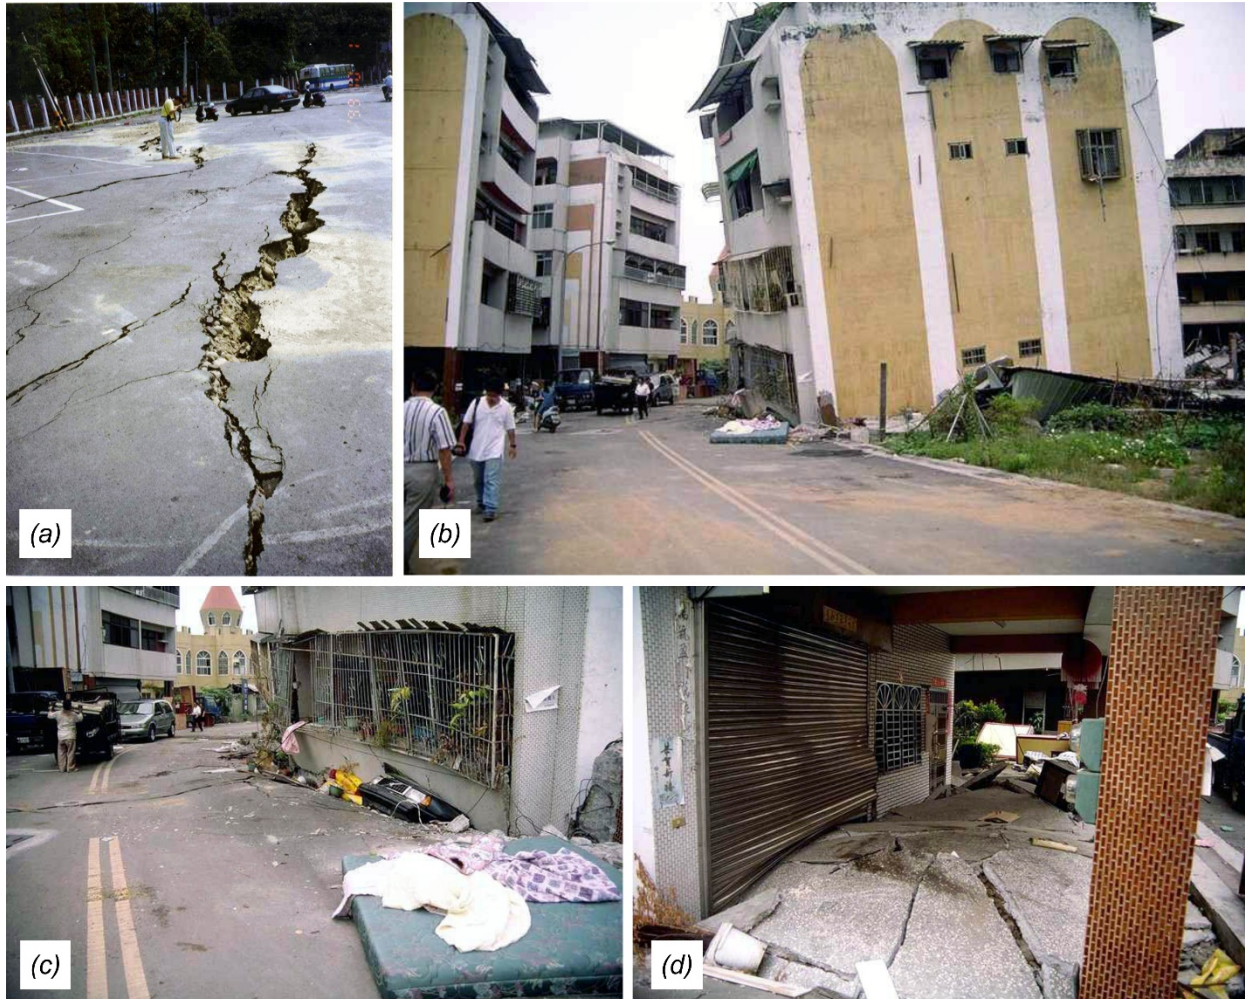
Examples of ground and structural failures in Wufeng during the Chi Chi Taiwan 1999 earthquake; (a) lateral spreading, (b) tilted 5-story structure and foundation failure. (c) close-up view of foundation failure of structure on right side of photo (b), and (d) foundation failure beneath a building (photos from PEER website: http://peer.berkeley.edu/lifelines/research_projects/3A02/)
